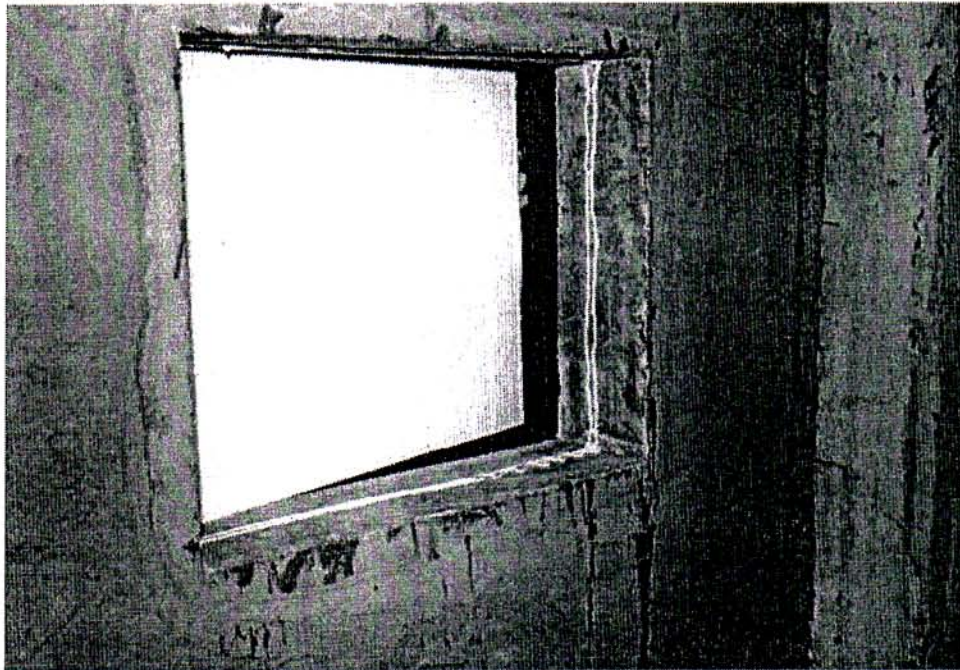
View of the steel frame with single-sided already bonded and coated mineral fibre board.
